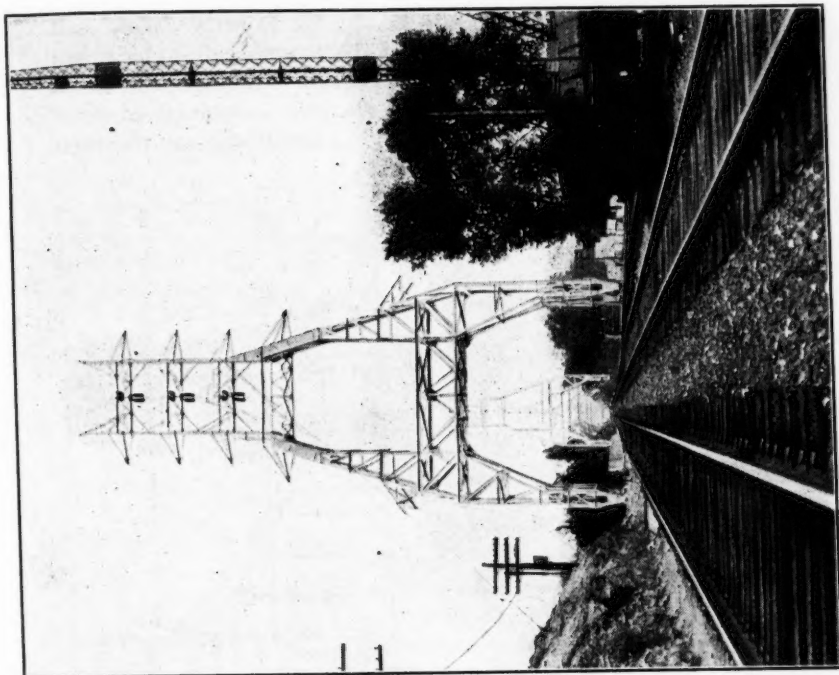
TYPE W BRIDGE STRUCTURE.
